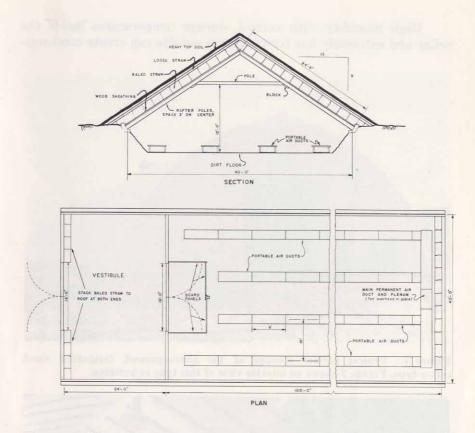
Floor plan and cross section drawings of a PARTIALLY BELOW GROUND, A-FRAME TYPE POTATO STORAGE CELLAR. These drawings show the air ducts in place as if the storage were full. The center ducts are portable and should be placed on the floor as the storage is filled. For proper operation the free end of all portable air ducts must be plugged. This is true for a partially filled storage as well as a filled storage. Complete working drawings for this cellar may be obtained by ordering PLAN No. .734-21, A-frame Type Potato Cellar, from the Agricultural Engineering Department, University of Idaho, Moscow.
